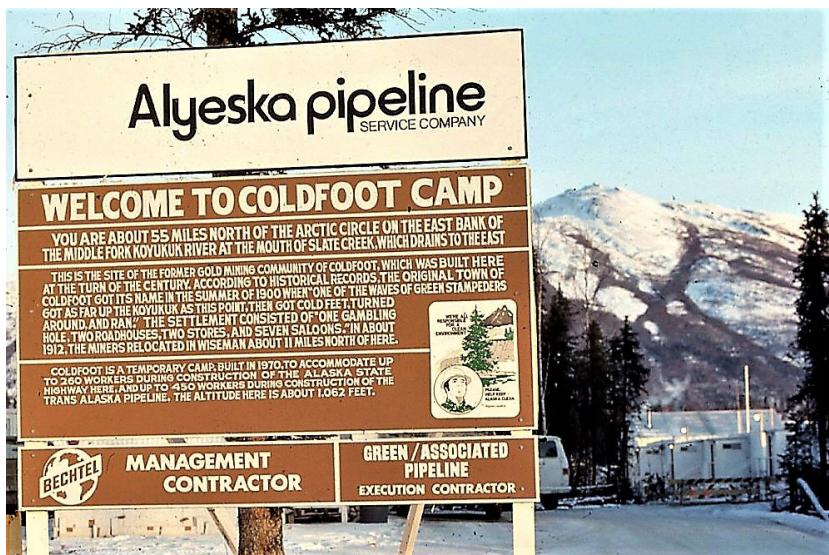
Author's photo at Coldfoot Camp during pipeline construction, March 1976.
